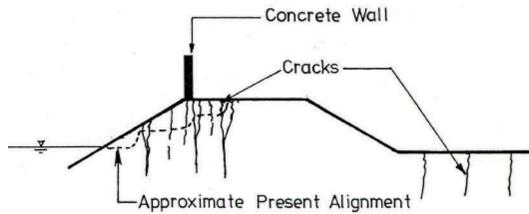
The illustration of damage to the floodwall foundations in the damage records for the earthquake, captioned in the report as “Damage Type: slumping of foundations with structures on top” (Jones 1987)
